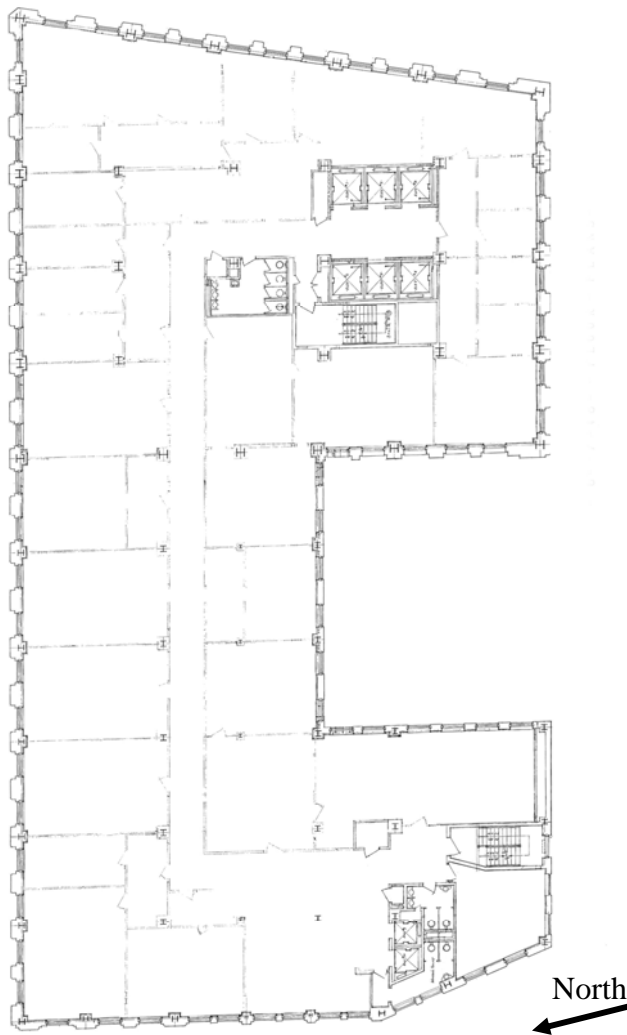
First Floor Plan (South Main Street level) with photo keys.
